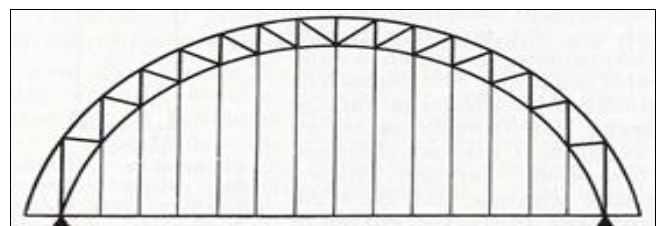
Bridge construction as an analogy for the structural organization of the back. The arch is connected to the horizontal deck by supporting members (Slijper, 1946, as cited in Nickel *et al.*, 1968^[3])
